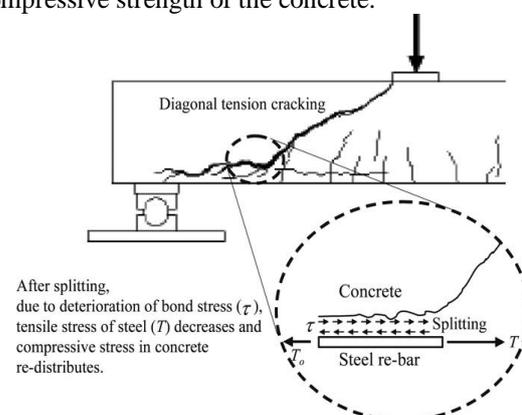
Shear failure mechanism of reinforced test beams without shear reinforcement.
